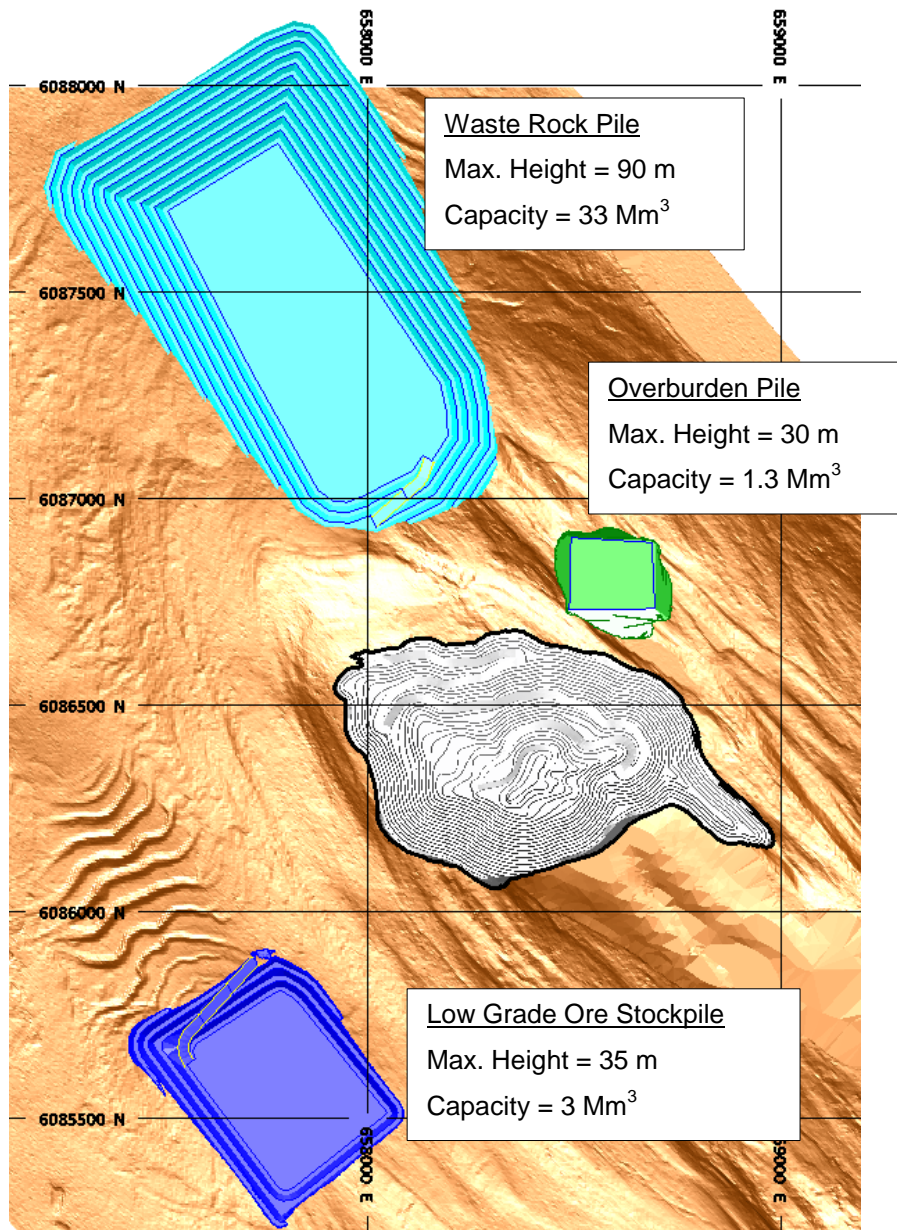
Elevation View of the Waste Rock, Overburden and Low Grade Piles
